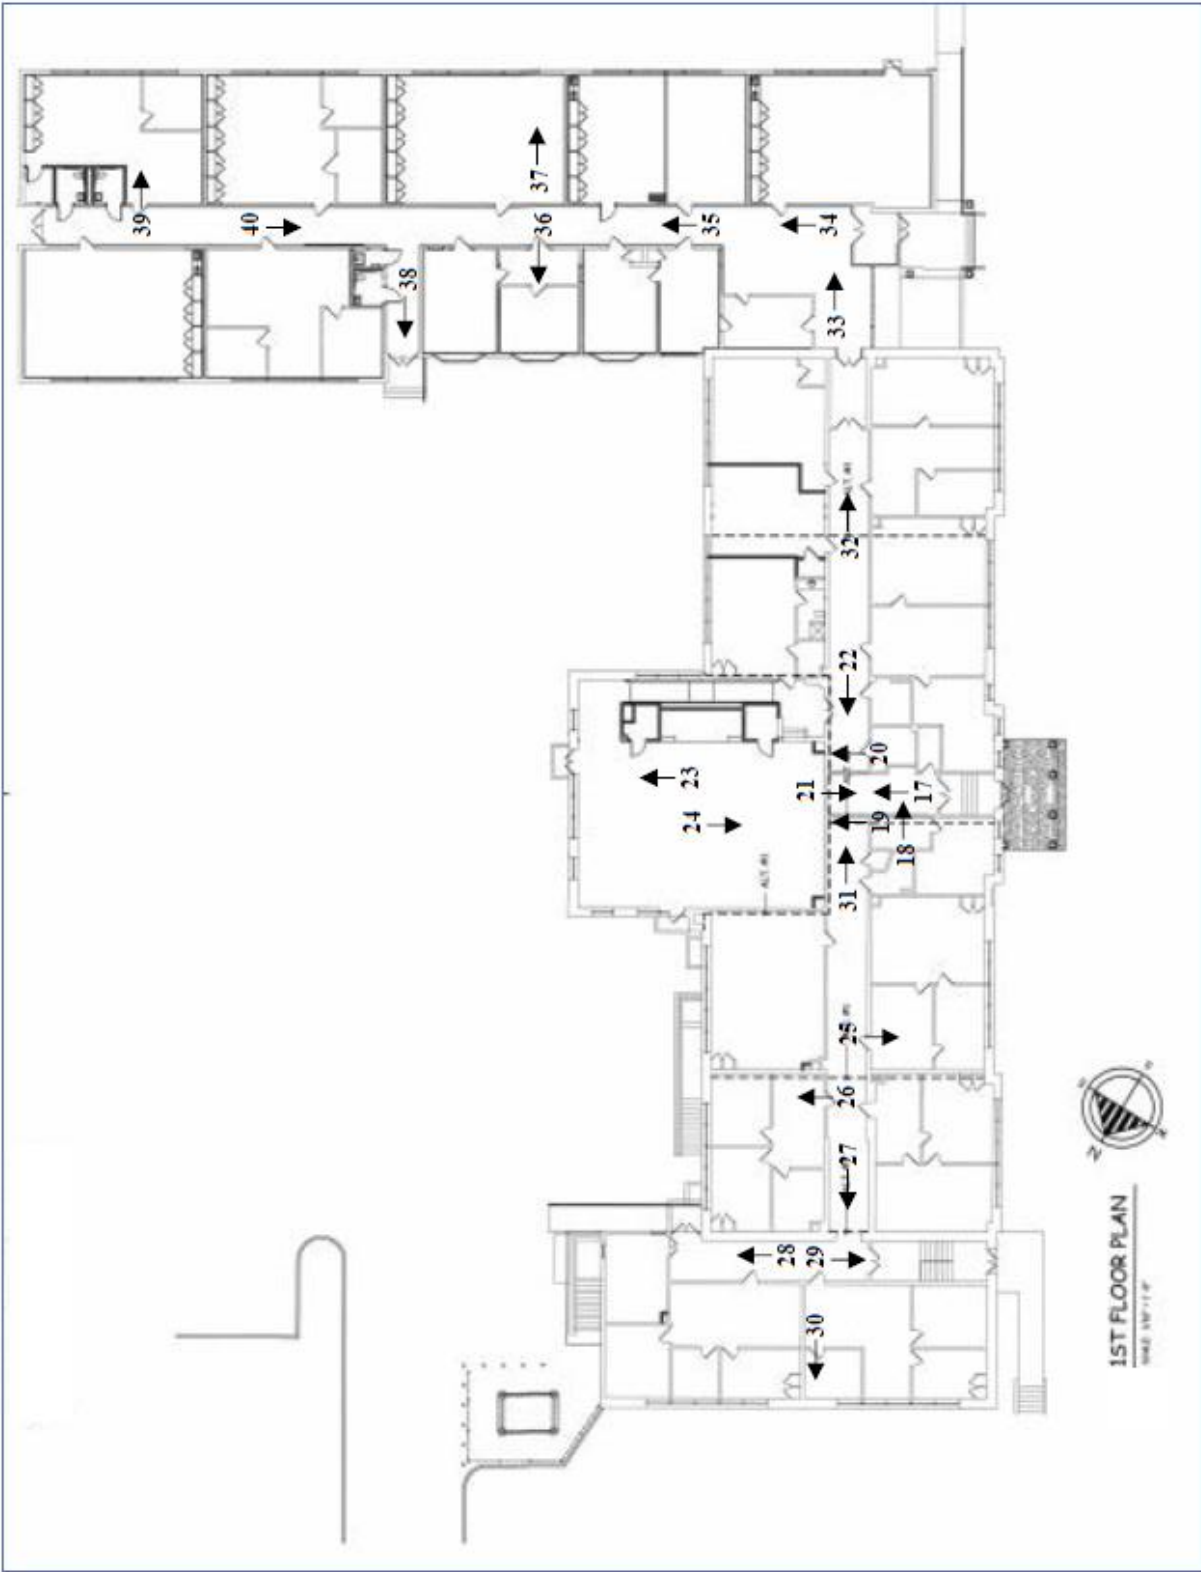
First Floor Plan: Photo locations (N.T.S.) Provided by Great Valley School District
